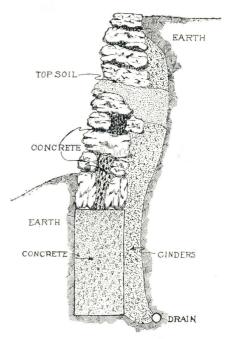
Profile of a concrete bound retaining wall, showing proper details of construction and a soil-filled fissure through the wall for planting.
